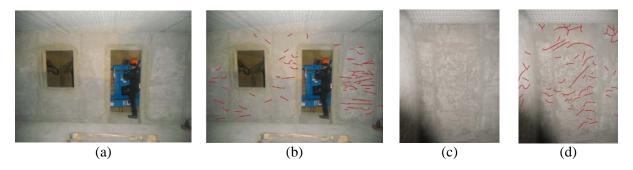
(a) and (c)Cracking pattern after the 0.5g white noise (inside third floor) (b) and (d) same walls with cracks underlined in red.
